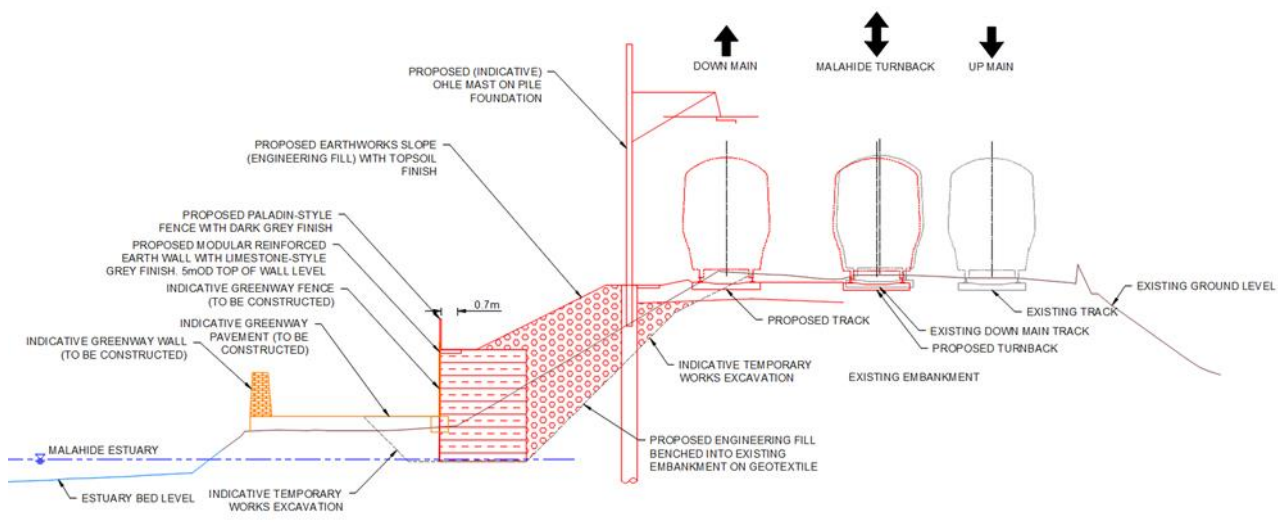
Typical Section of new Malahide Turnback Modular Reinforced Earth Wall
